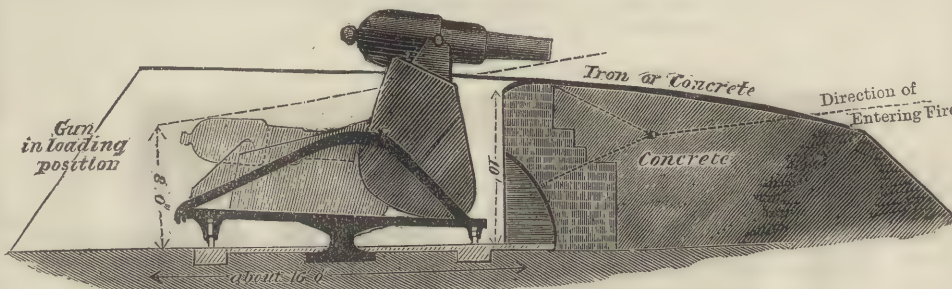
SECTION SHOWING THE AMOUNT OF PROTECTION AFFORDED BY THE PARAPET TO GUNS MOUNTED ON MONCRIEFF CARRIAGES.
